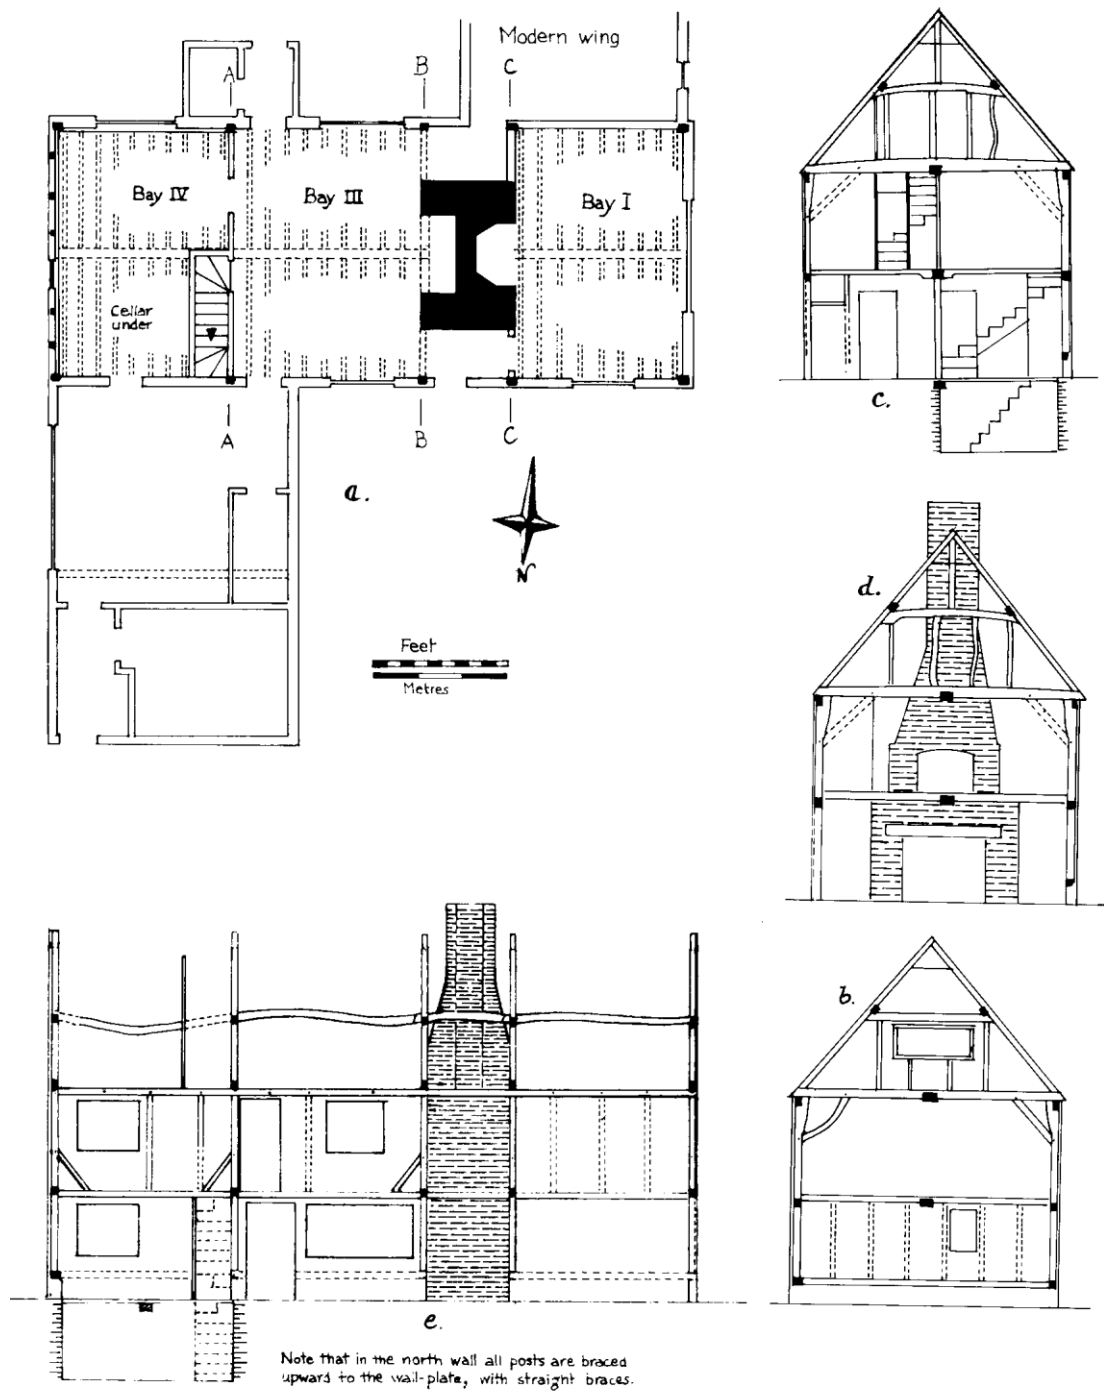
Luckings Farm, (a) Ground floor plan, (b) East gable, from the east, (c) Section at A-A, looking west, (d) Section at B-B, looking west, (e) Cut-away view of main range, looking south. In the north wall the posts are braced upwards to the wall-plates, with straight braces.
